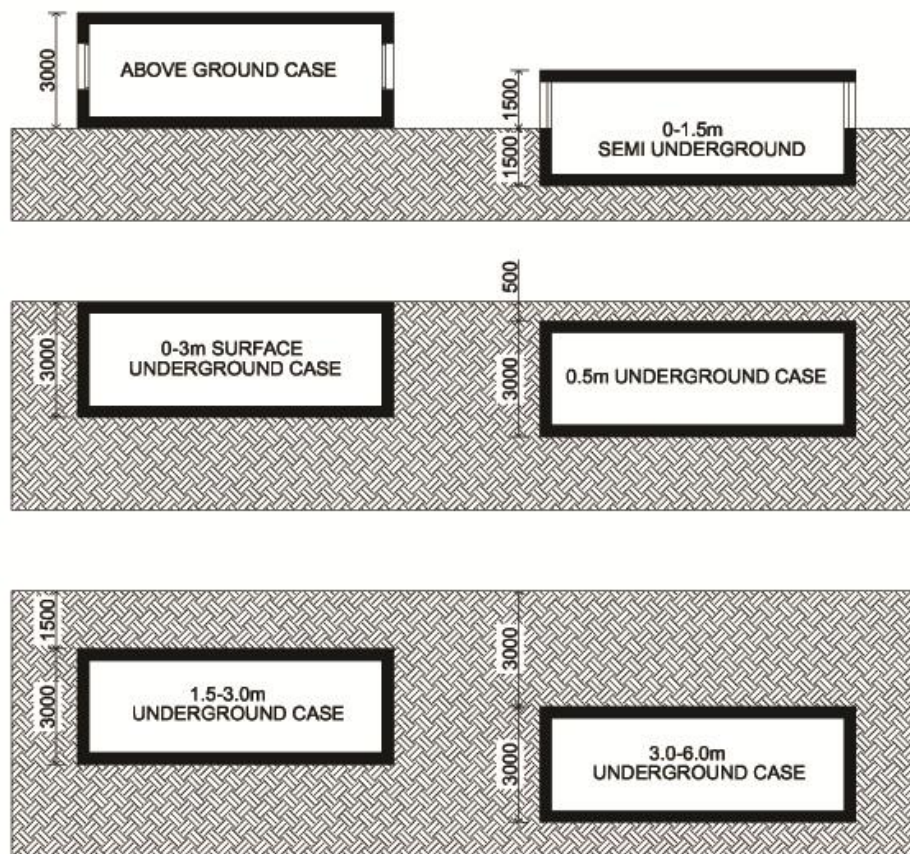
Showing the model section of above ground, semi underground and underground space configuration
